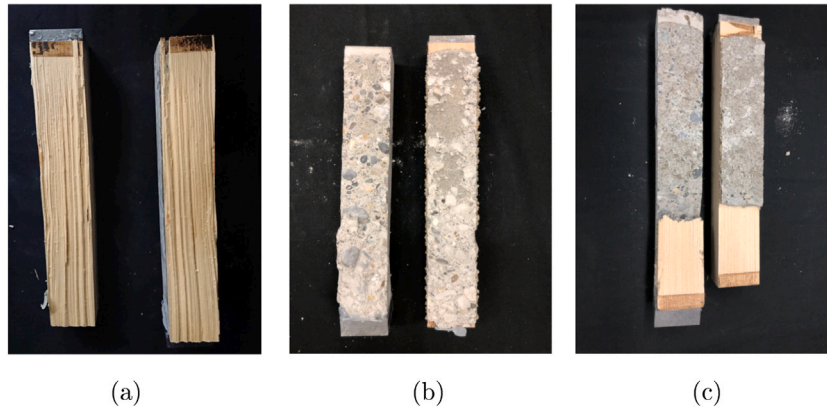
Failure modes of bond specimens (a) Near-surface shear failure in timber — plan view (b) Near-surface shear failure in concrete — plan view (c) Mixed near-surface shear failure in timber and concrete — plan view.
